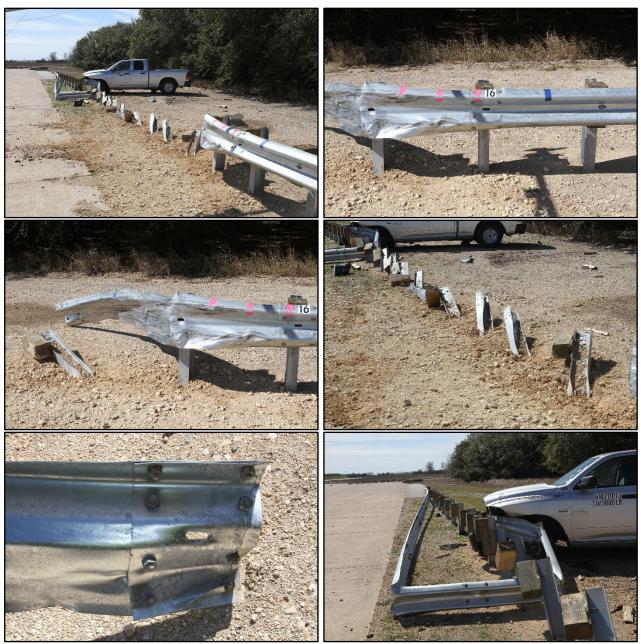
MGS with Half Post Spacing after Test No. 610211-01-3.
